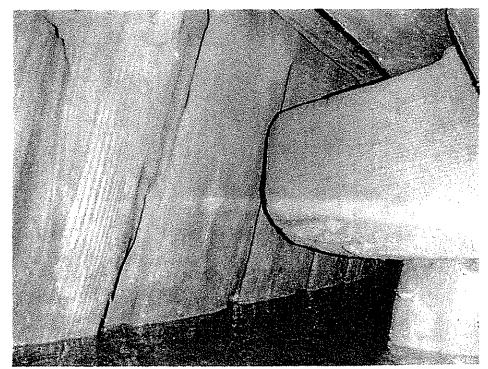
General view of deterioration in timber sheet pile bulkhead. Note gaps and rot in the timber sheet pile.
